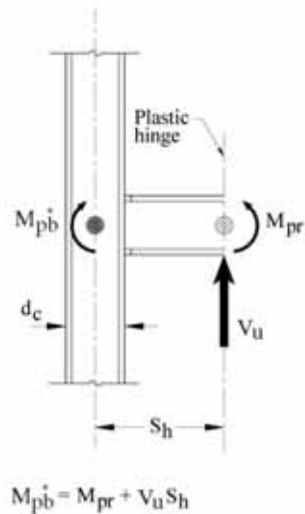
Forces at column centerline from beam plastic hinge.
